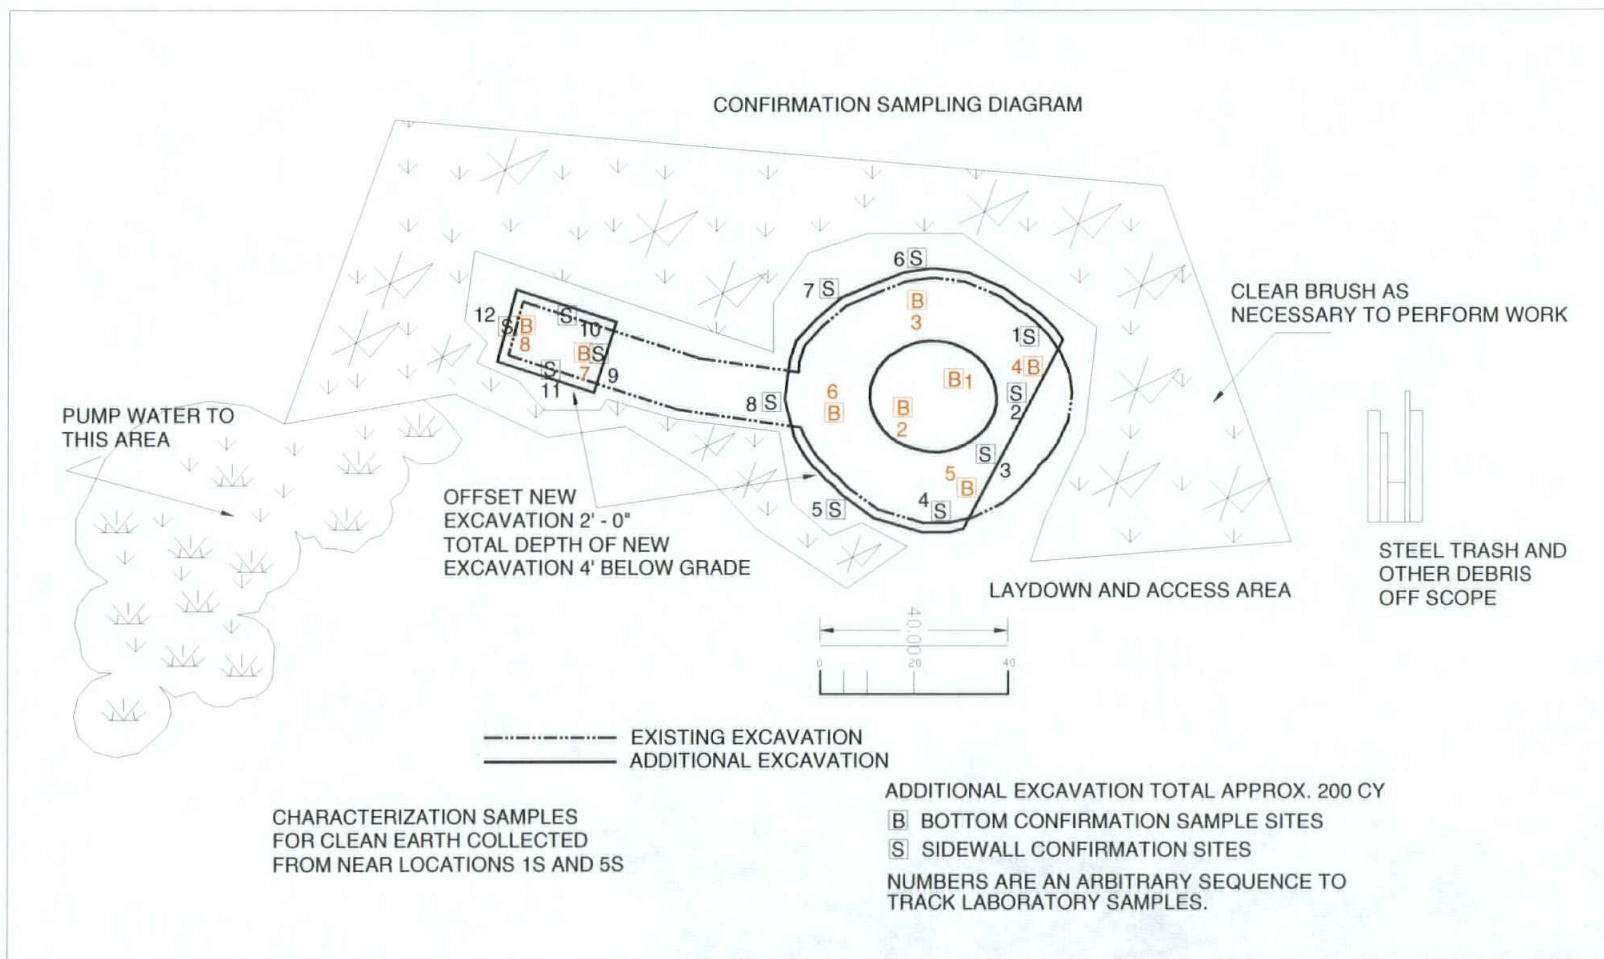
Site Sketch Illustrating Work Requirements and Work Plan
